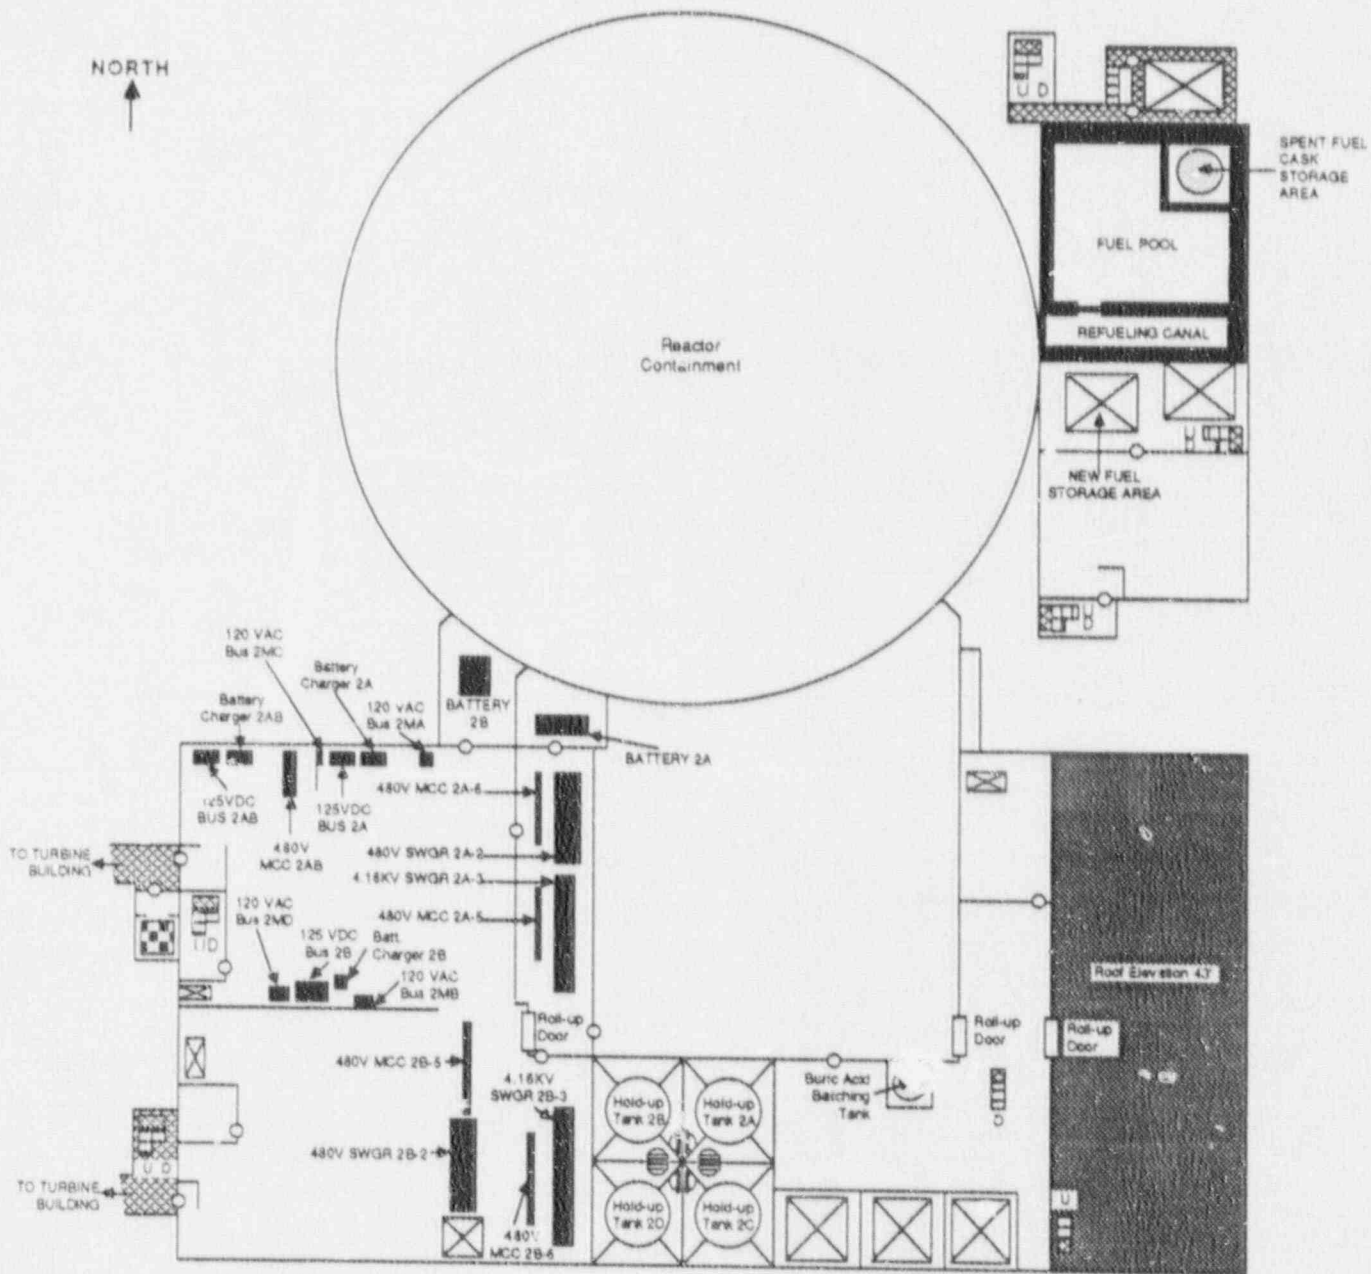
St. Lucie 2 Reactor Building, Elevation 45', Auxillary Building, Elevation 43', and Fuel Handling Building, Elevation 48'
